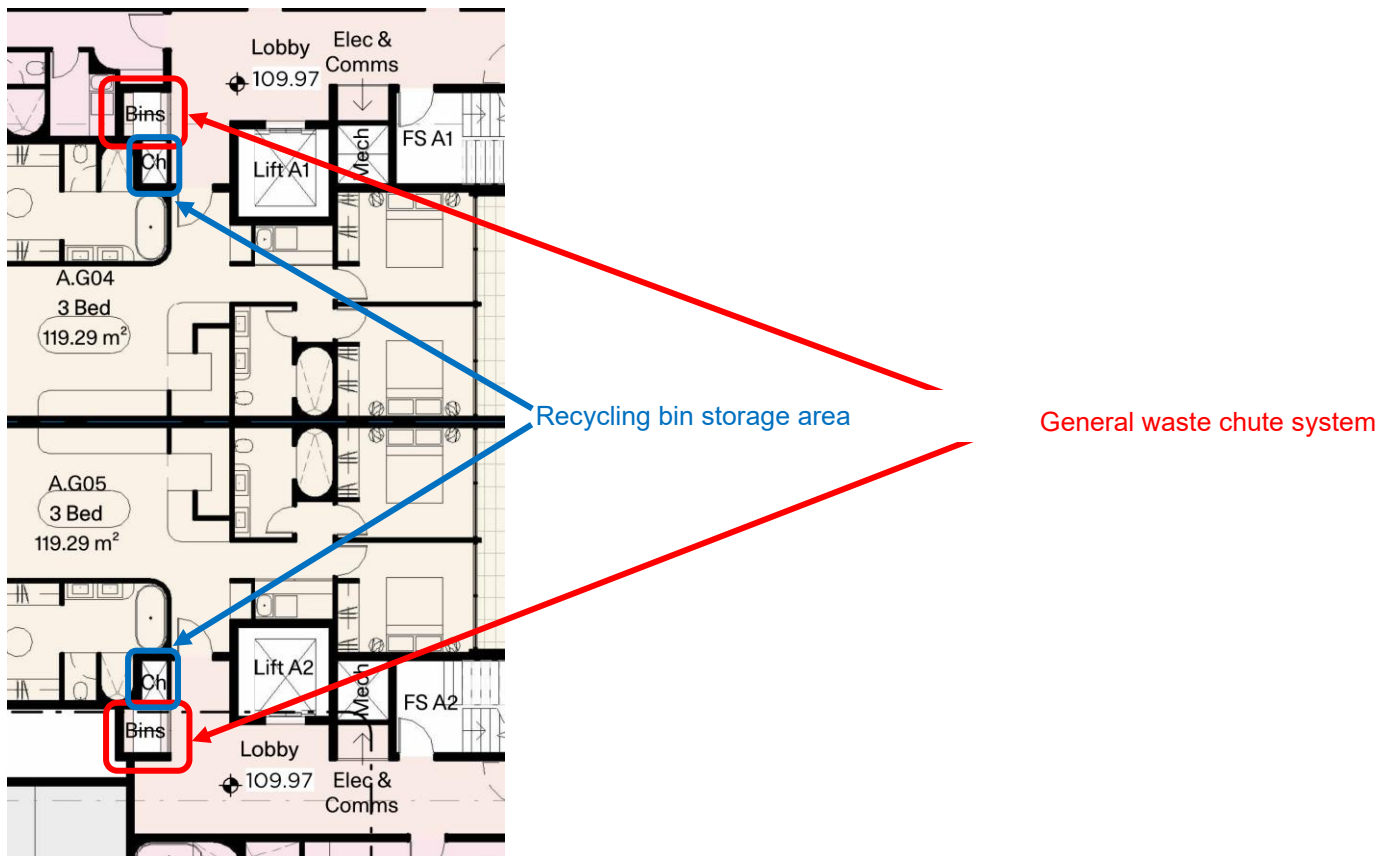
Excerpt of ground floor of Building A (Source: PMDL Architects)
